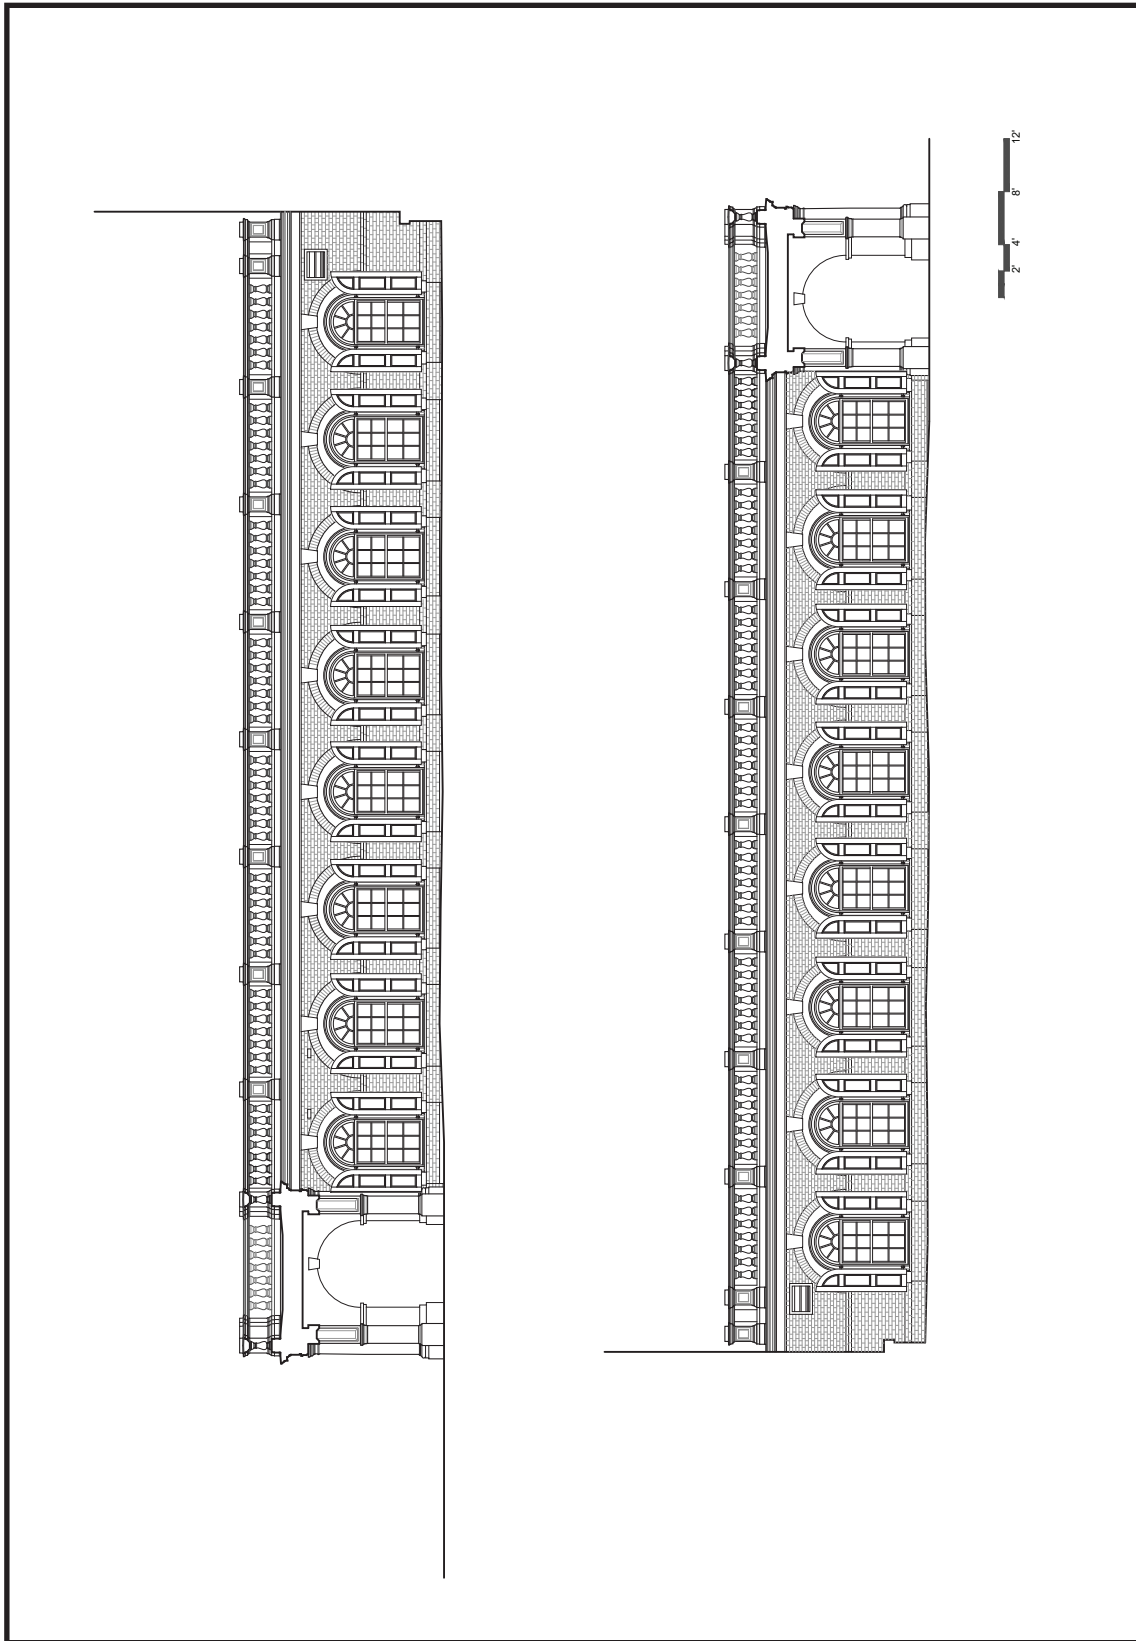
South elevations, northwest wing, west courtyard (top); and northeast wing, east courtyard (bottom). Drawings by John G. Waite Associates, Architects, 2022.
